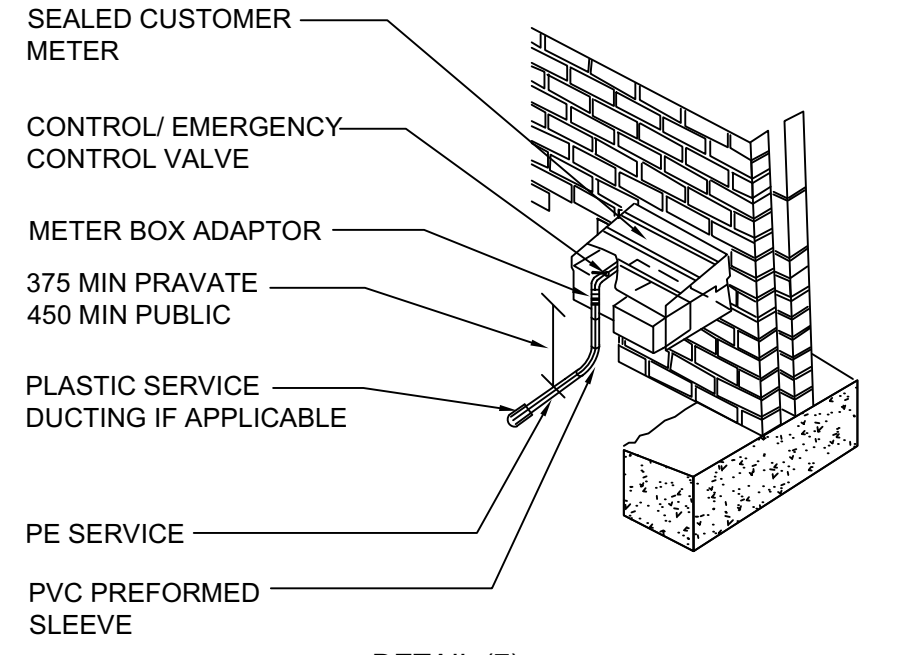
TYPICAL DETAIL FOR GAS PIPES
